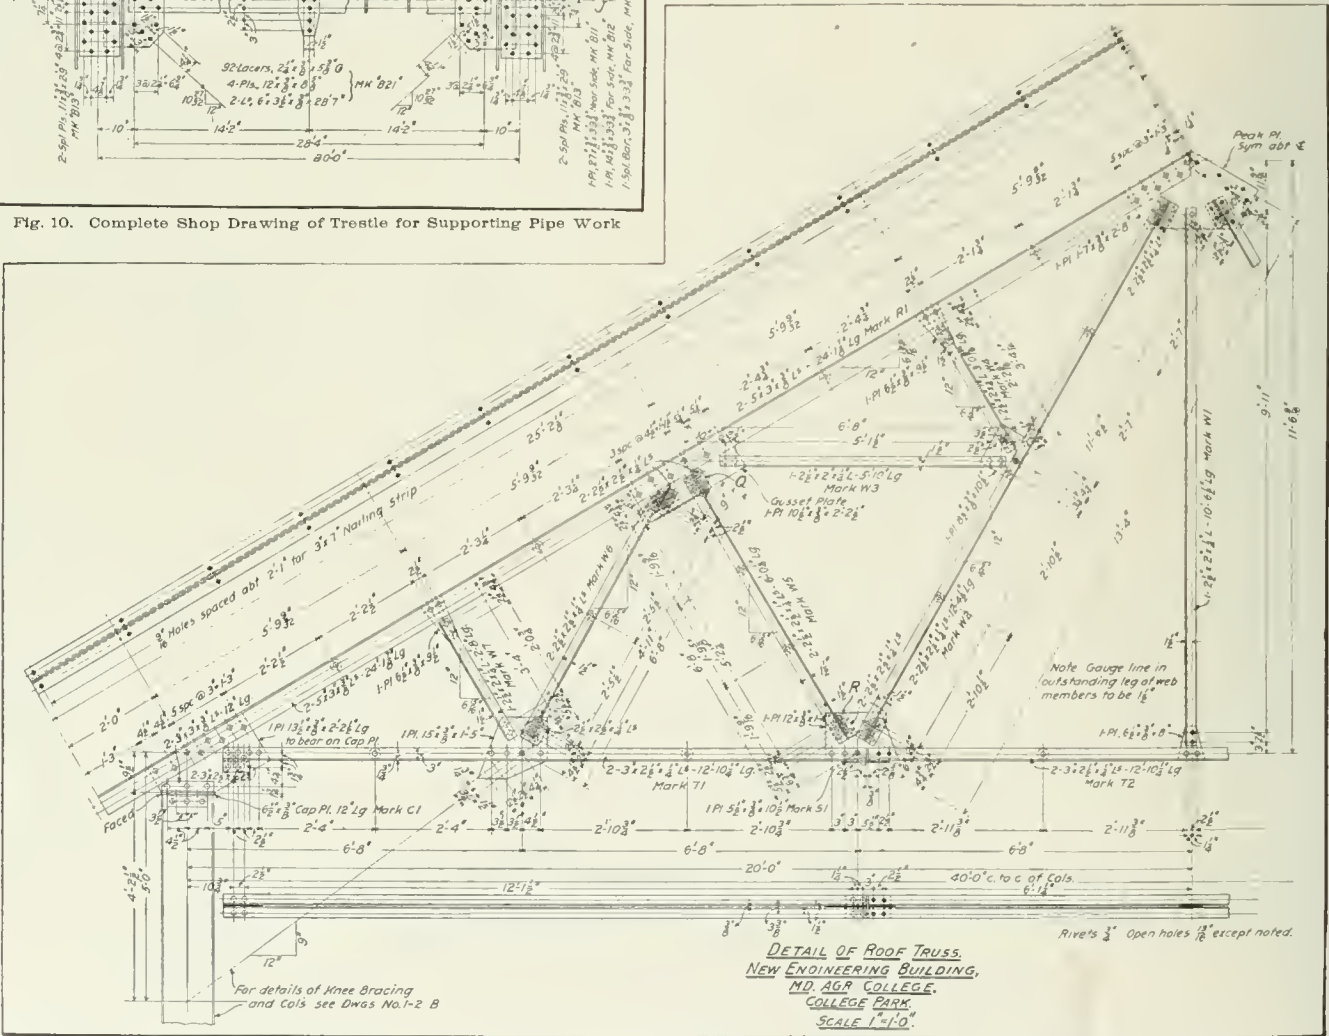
Complete Shop Drawing showing One-half of a Steel Roof Truss
